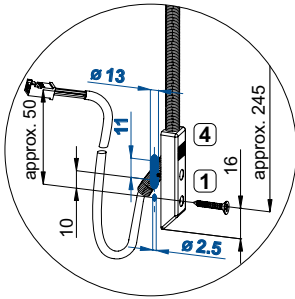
Detail KÜ-T1-STV without cover plate (dimensions in mm)
